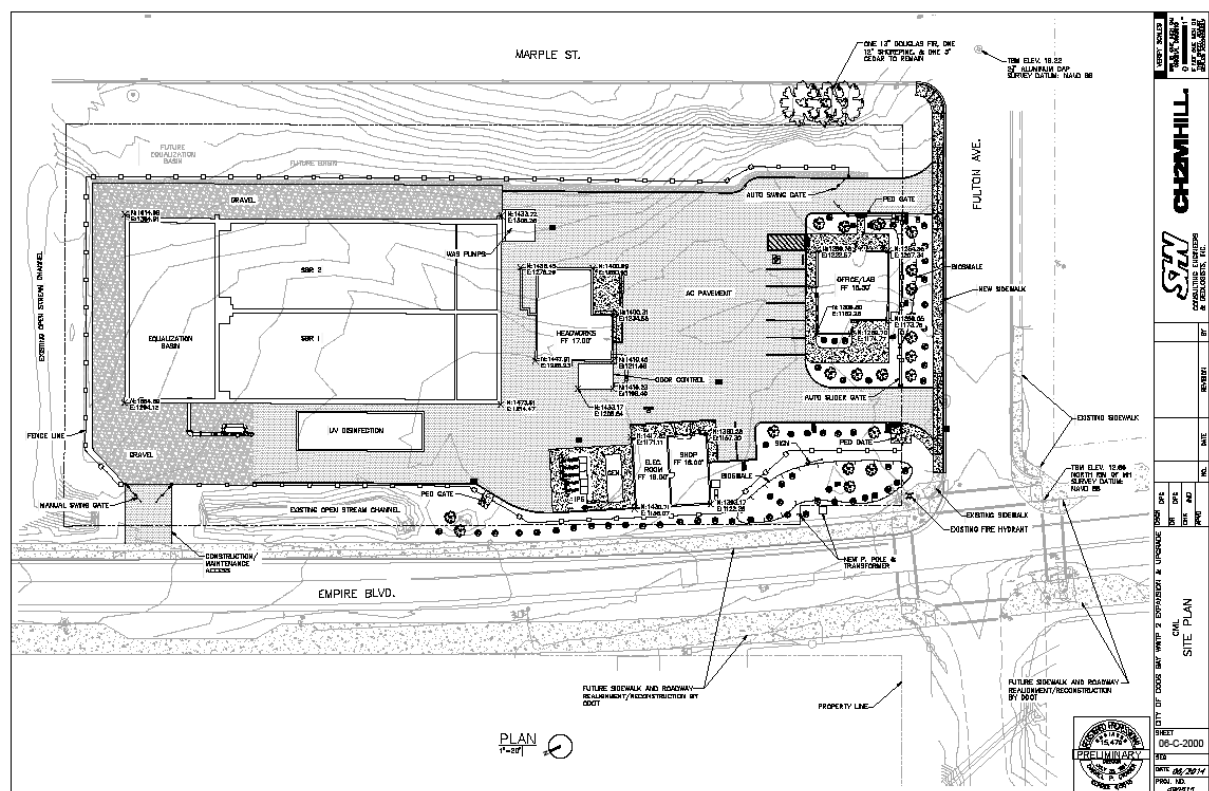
Overall site plan for new WWTP No. 2 (Proposed Action).
